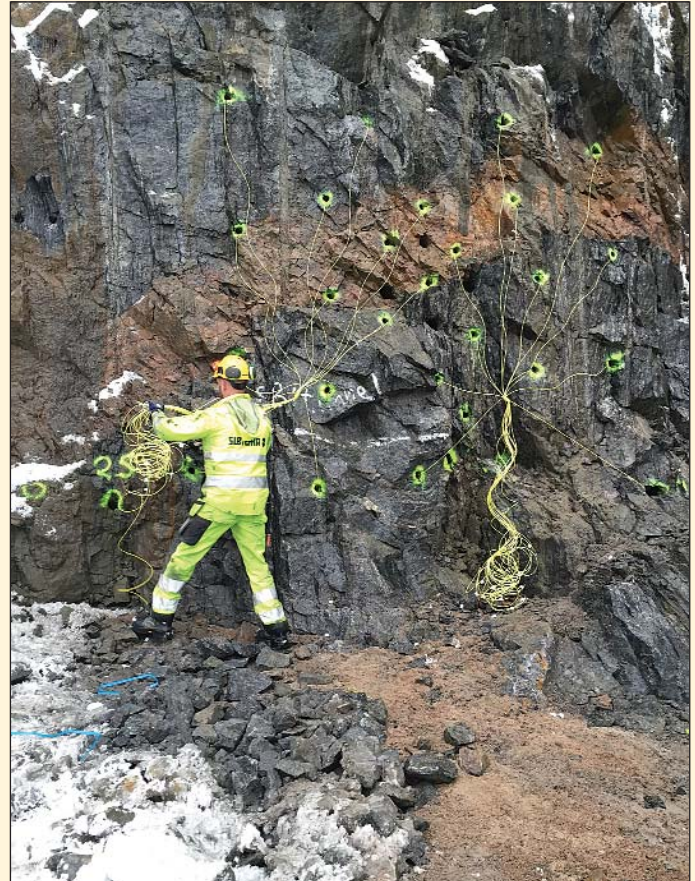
The Skärholmen tunnel, commencement of tunnelling
